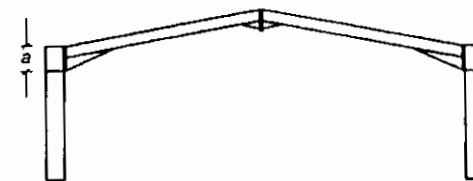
Use of haunches in portal frame construction. (Ref. 11.)
